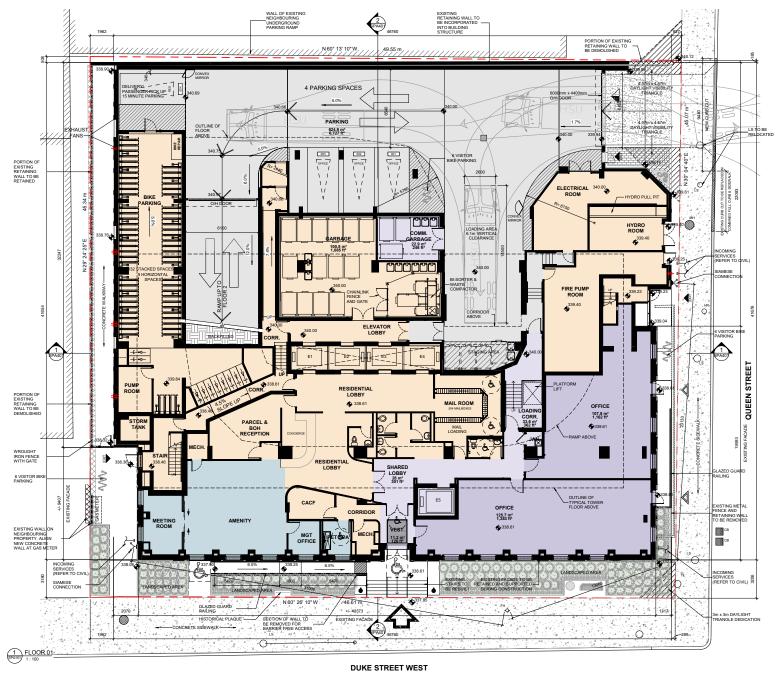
Level 1 Plan showing the retained portion of the Heritage Building along Duke and Queen Streets and new rear addition. Source: Design Package, Turner Fleischer Architects, May 2023.
